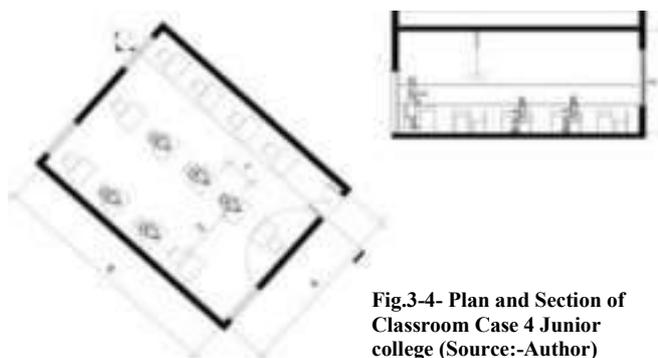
Plan and Section of Classroom Case 4 Junior college (Source:-Author)
